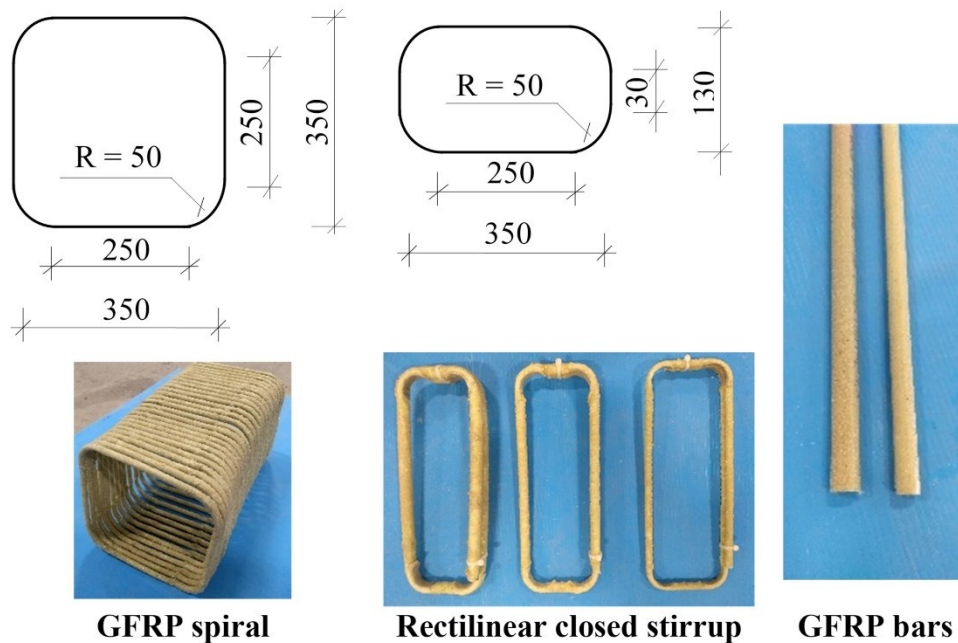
Details of the GFRP bars, spirals, and cross ties (unit: mm)
